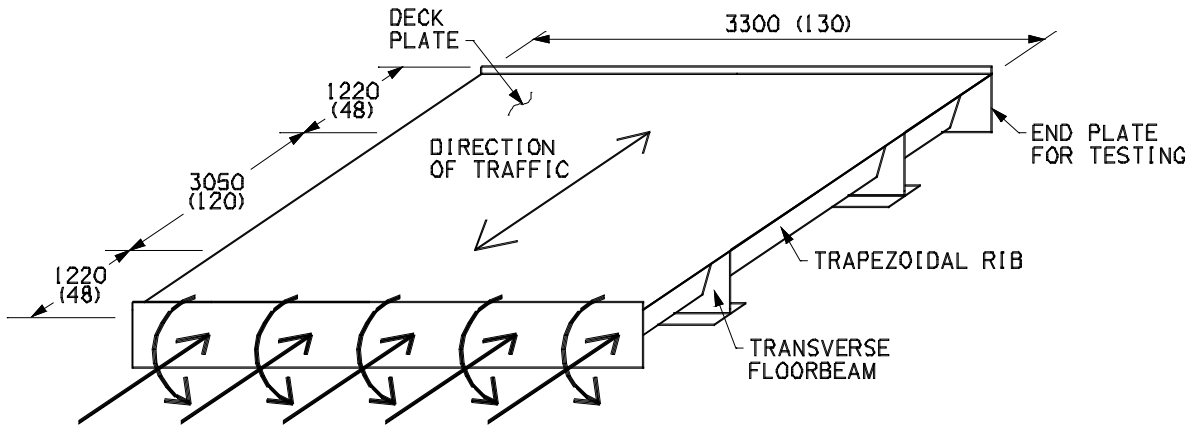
Loading applied to the five trapezoidal rib orthotropic deck finite element model - beam-column analysis (units: millimeters (inches))
